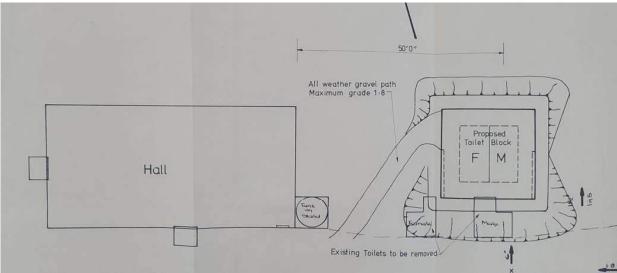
Plans showing the proposed toilet block to be built at the rear of the hall, 1975. (PROV 1925-85, Public Building File)
